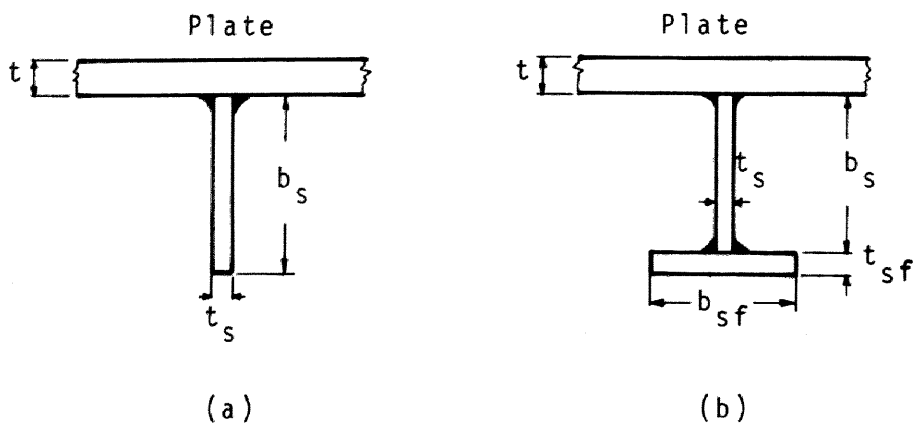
Cross-Sections of Stiffeners; (a) Rectangular, and (b) Structural Tee.
